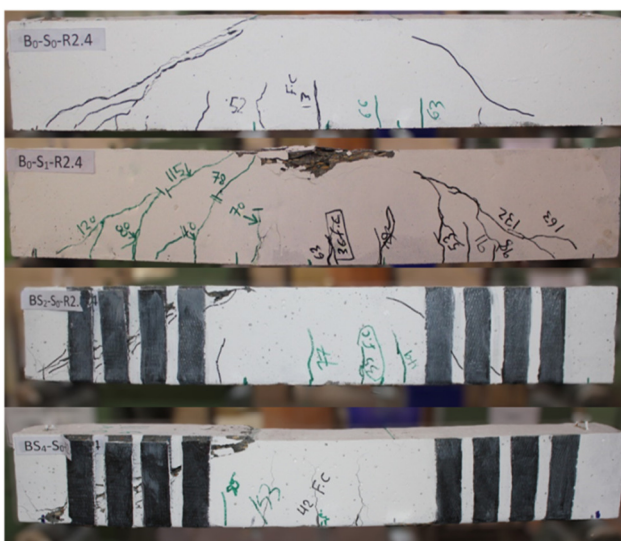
Cracking patterns of the tested beams at ratio 2.4.
